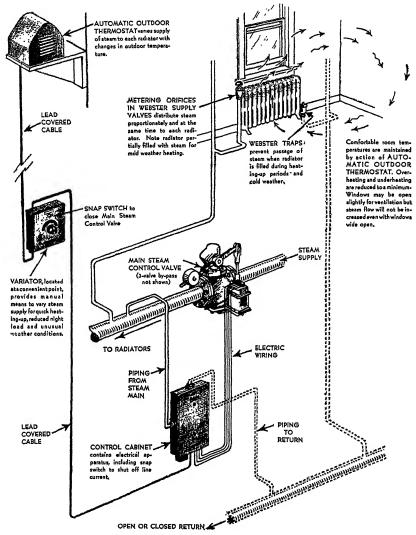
Standard Arrangement of Improved Webster System with Webster Electric Moderator Control, Using a Single Main Steam Control Valve
